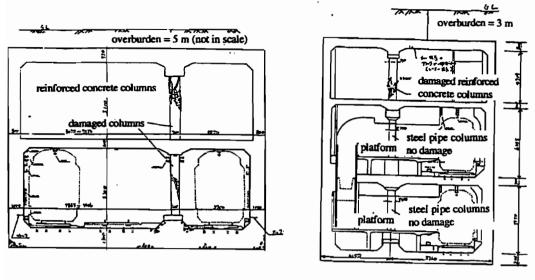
Collapsed section of the Daikai station (JSCE, 1995)
